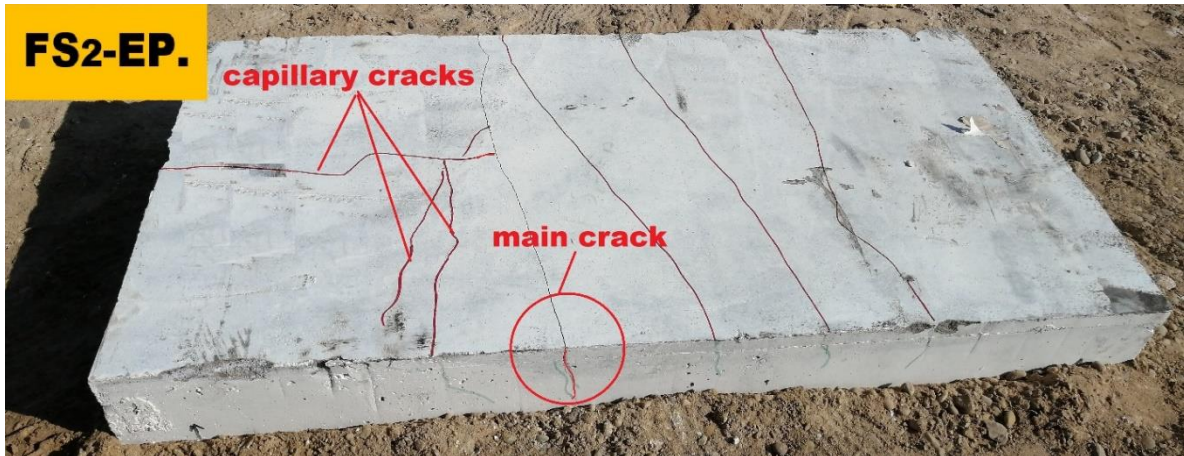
Mode of failure and crack patterns for specimen FS2-EP.
